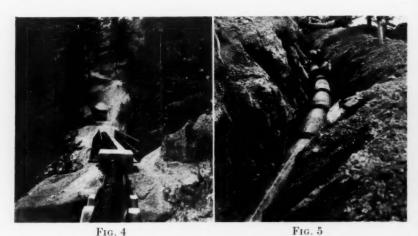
Near Lower End, Middle Section Fig. 5. Rock Cut
